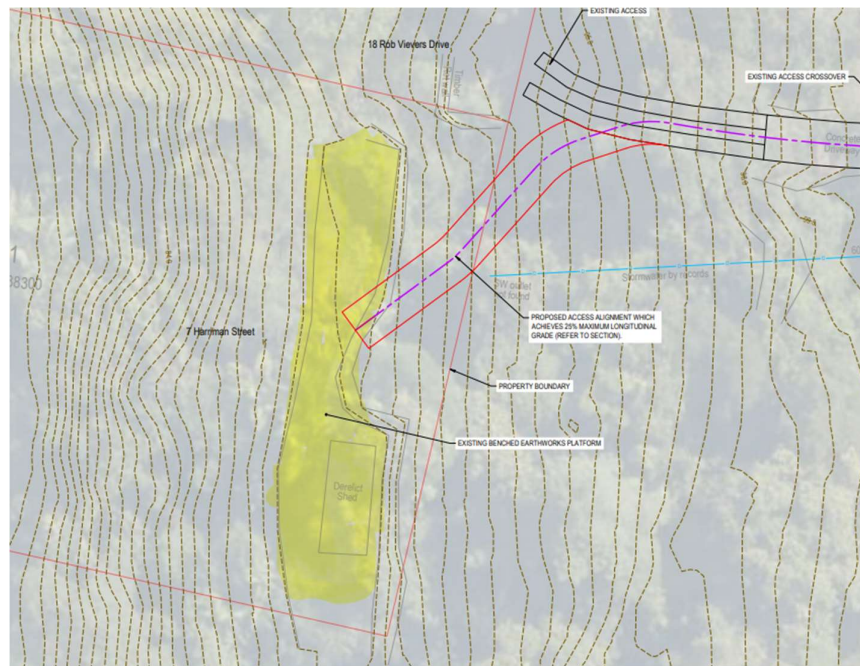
Proposed building envelope within band of flat land containing existing infrastructure.
